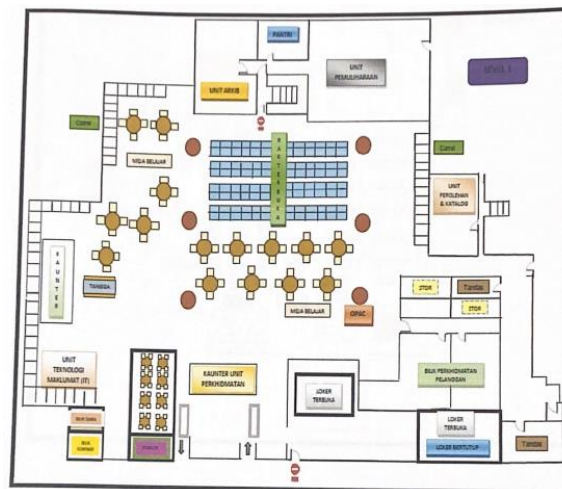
(a) Tengku Anis Library Floor Plan Level 1
